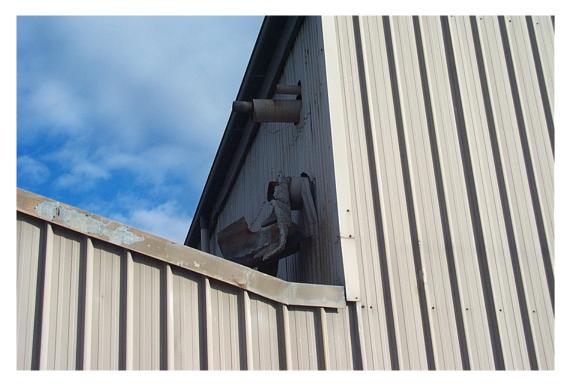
Exposed insulation from lagged pipes (northern end of Building 5)
